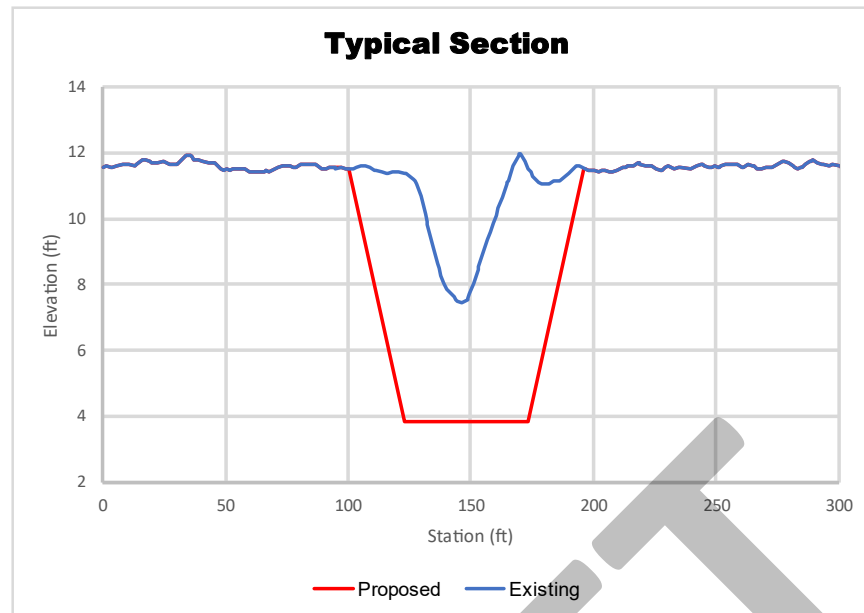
TYRRELL PARK IMPROVEMENTS TYPICAL SECTION
